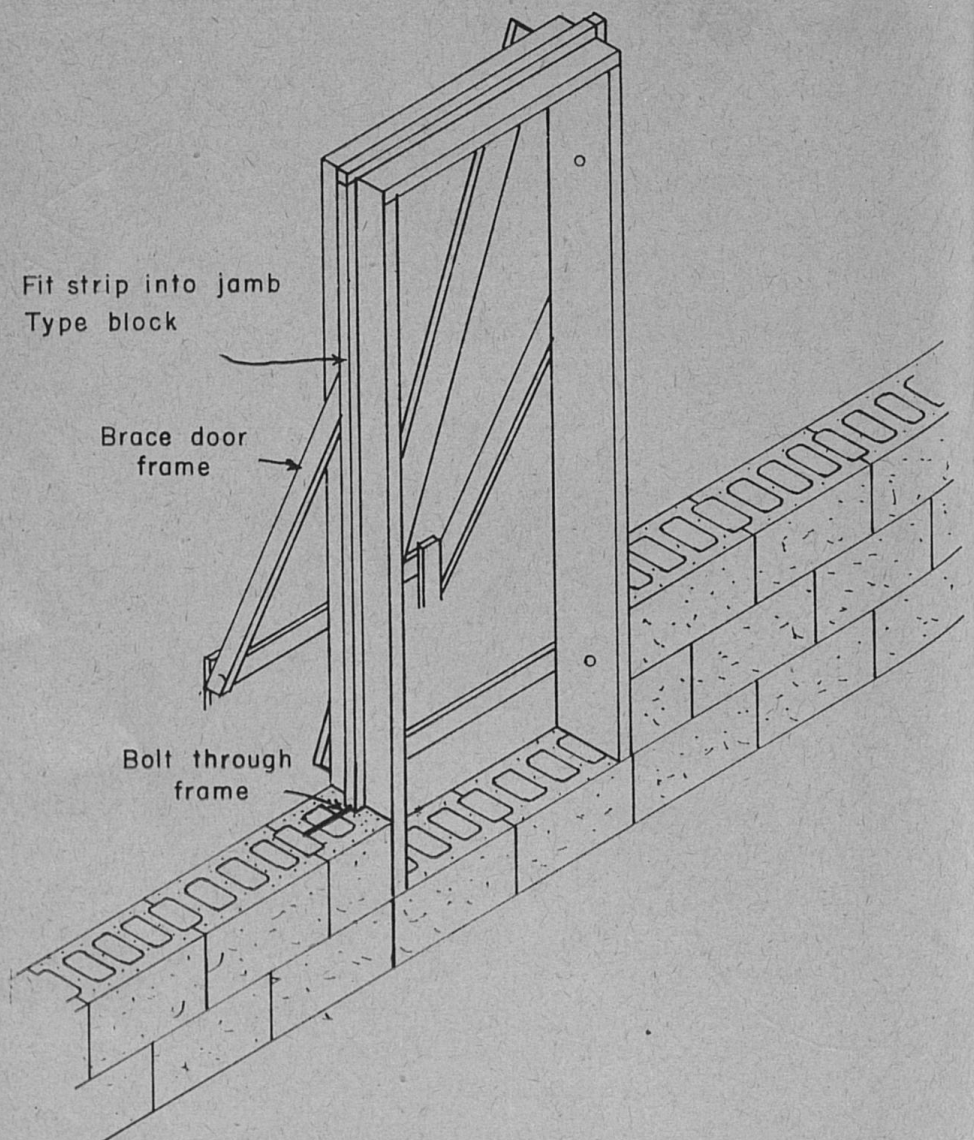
Temporary bracing of the door in its correct position is necessary before the wall can be set. Bolts through the door frame extending into the mortar joints help to secure the door.
